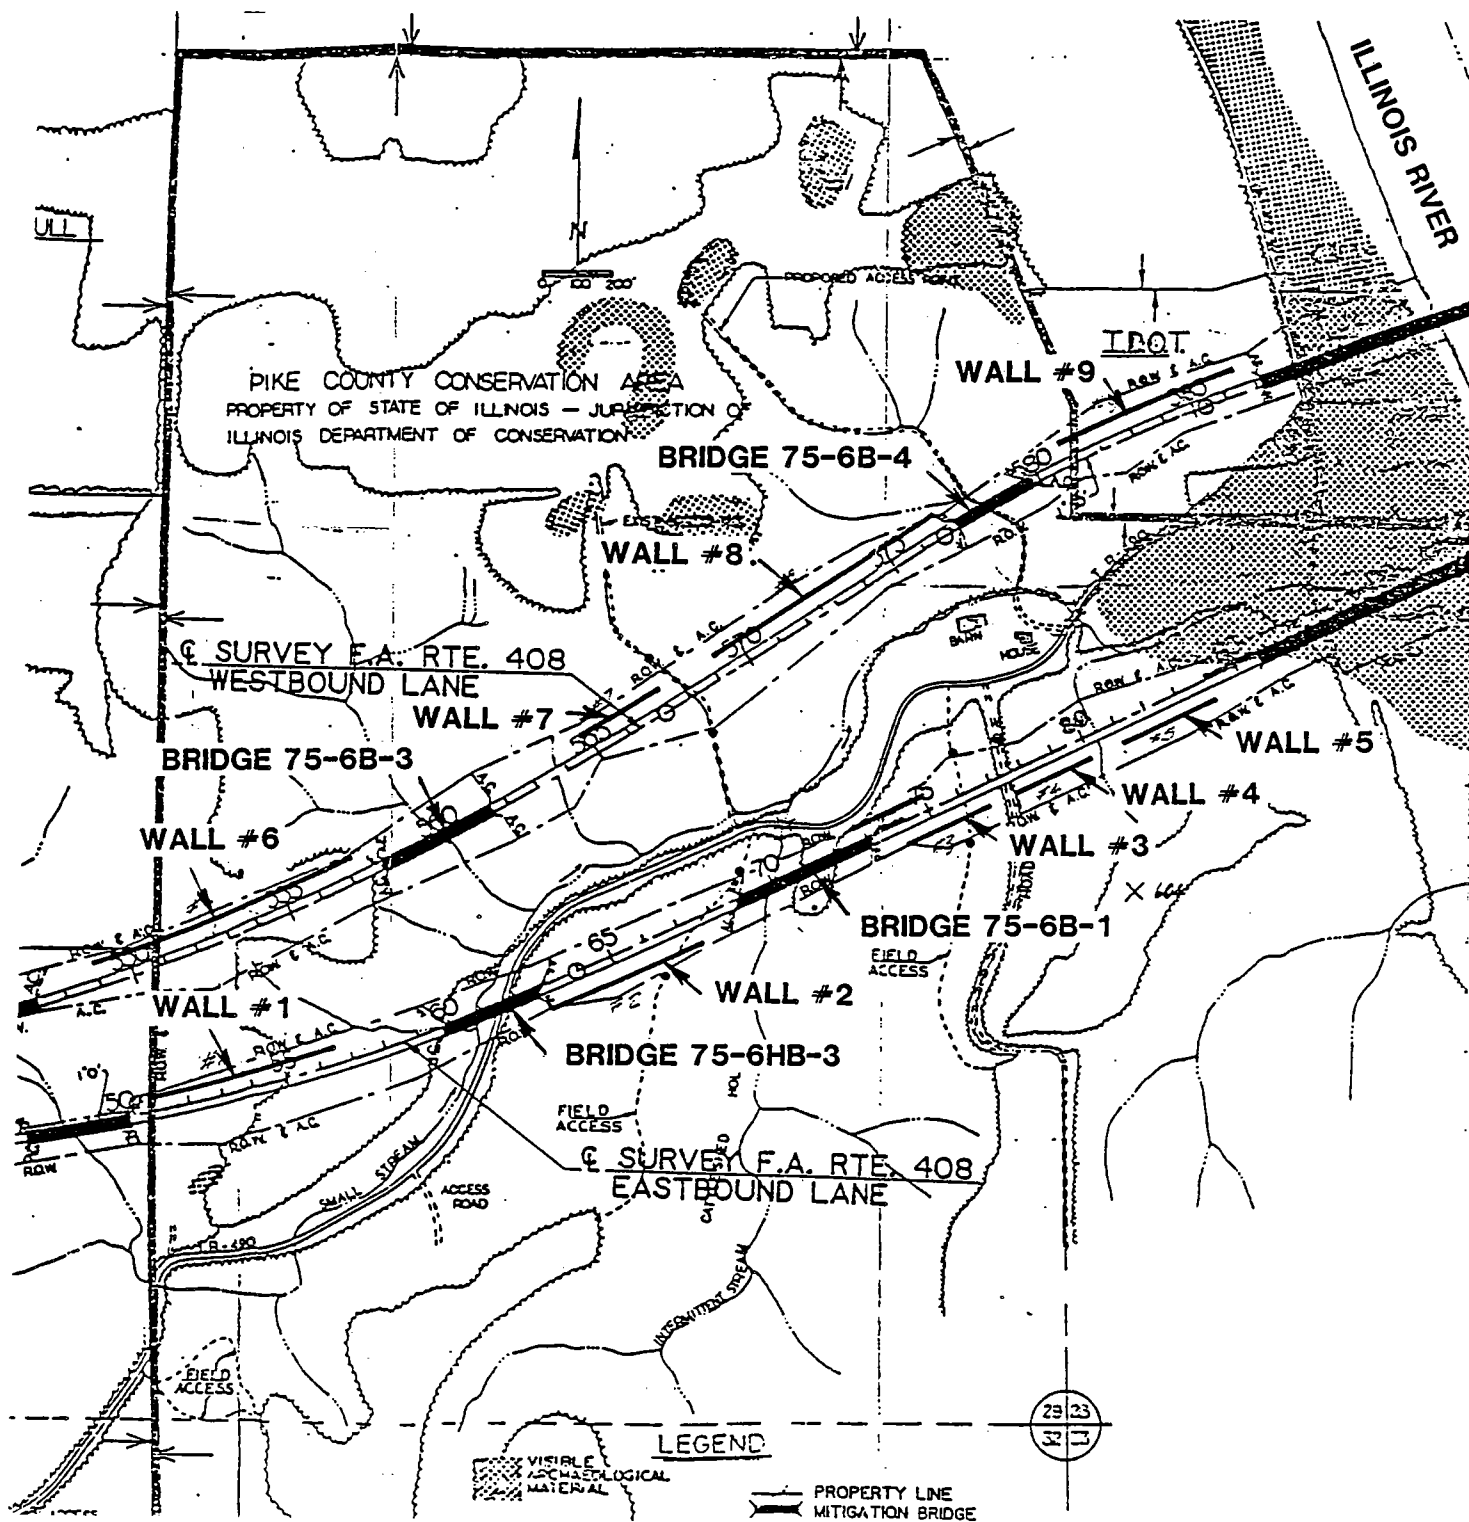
Plan map of proposed retaining wall and bridge locations.
